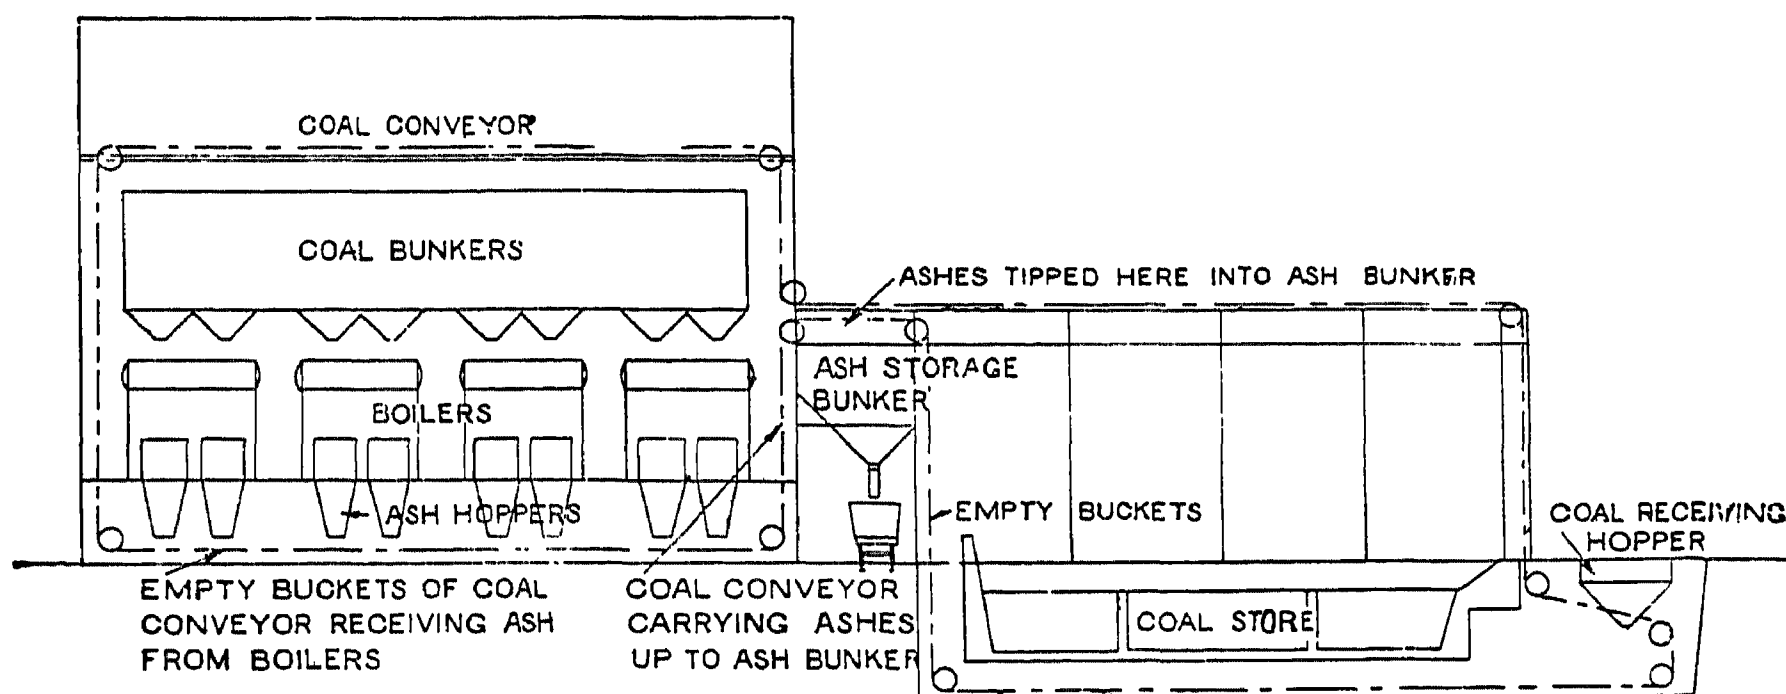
Typical Arrangement of Coal Elevator designed to handle both Coal and Ashes
